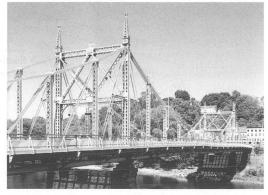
Northampton Street Bridge, Easton, Pennsylvania—a double cantilever bridge constructed with the visual form of a suspension bridge (HAER PA-502, photo 3; Jet Lowe, photographer)
